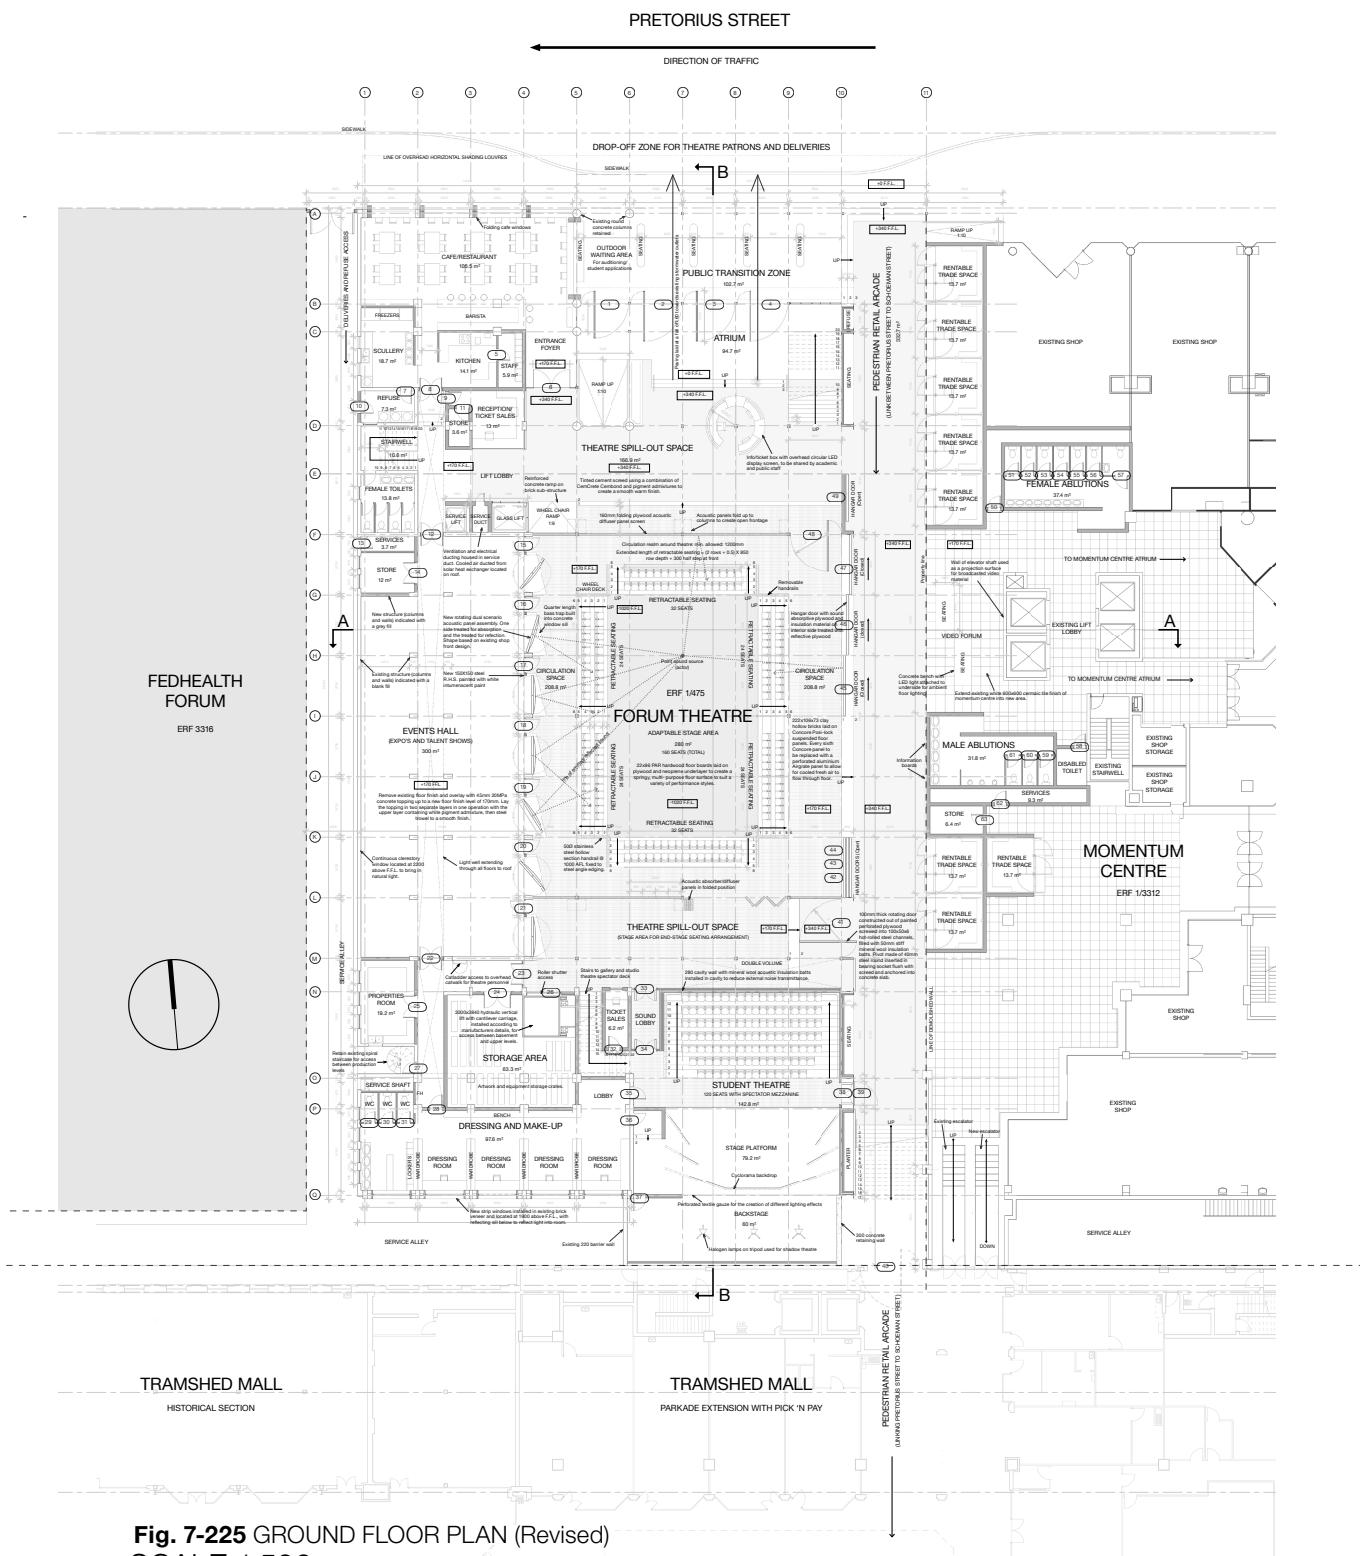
GROUND FLOOR PLAN (Revised)
